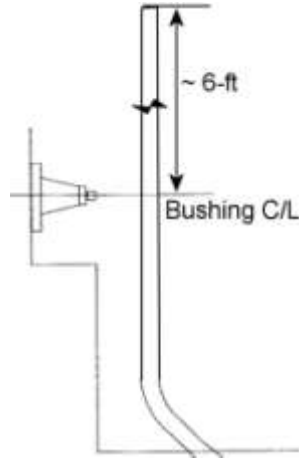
Strip Cable Jacket 13-inches Past Bushing Centerline.
